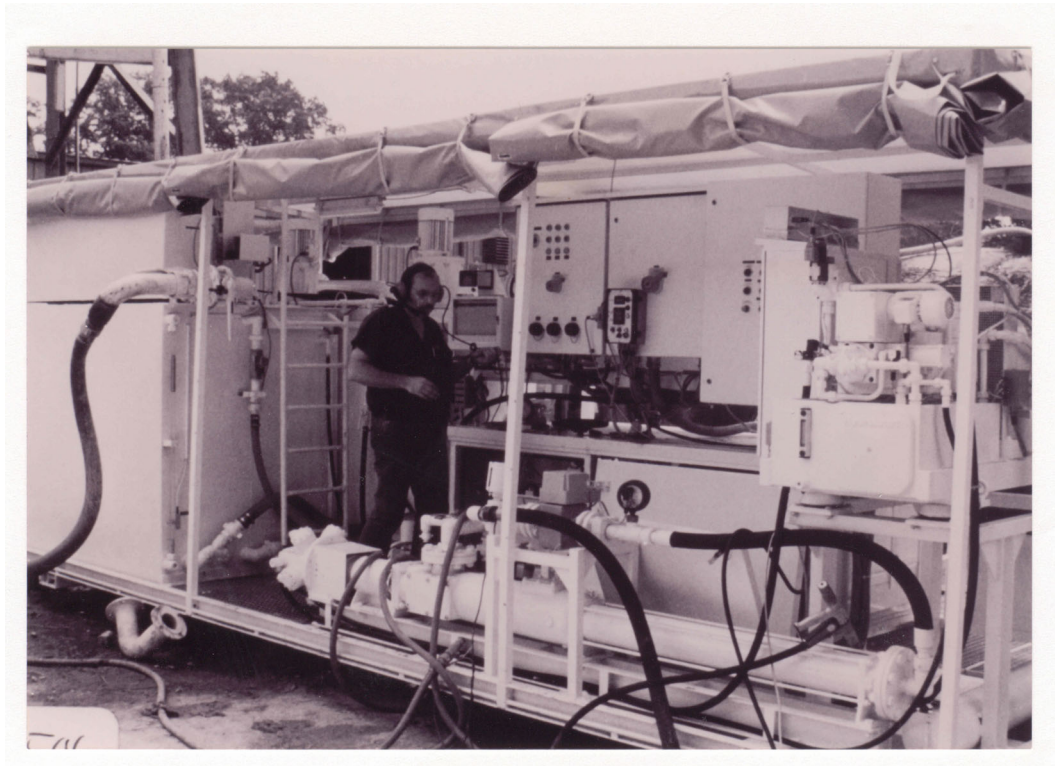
Pumping Station for Triple Fluid Jet Grouting.
